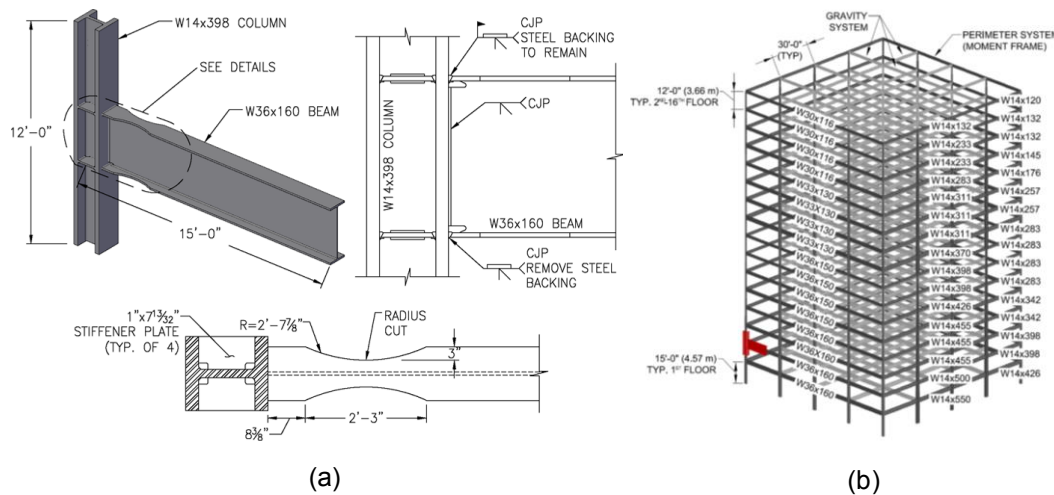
a) Details of the modelled RBS connection and b) location of connection in the subject frame
